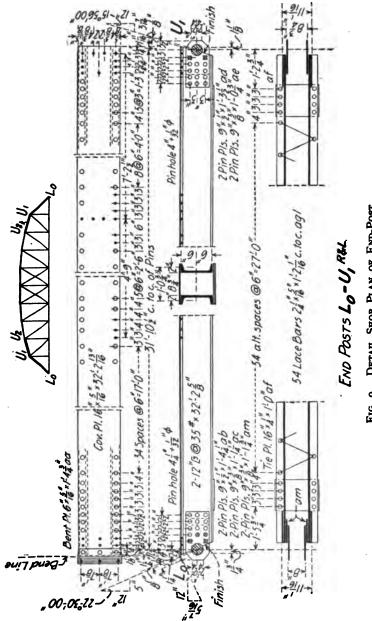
DETAIL SHOP PLAN OF END-POST.
